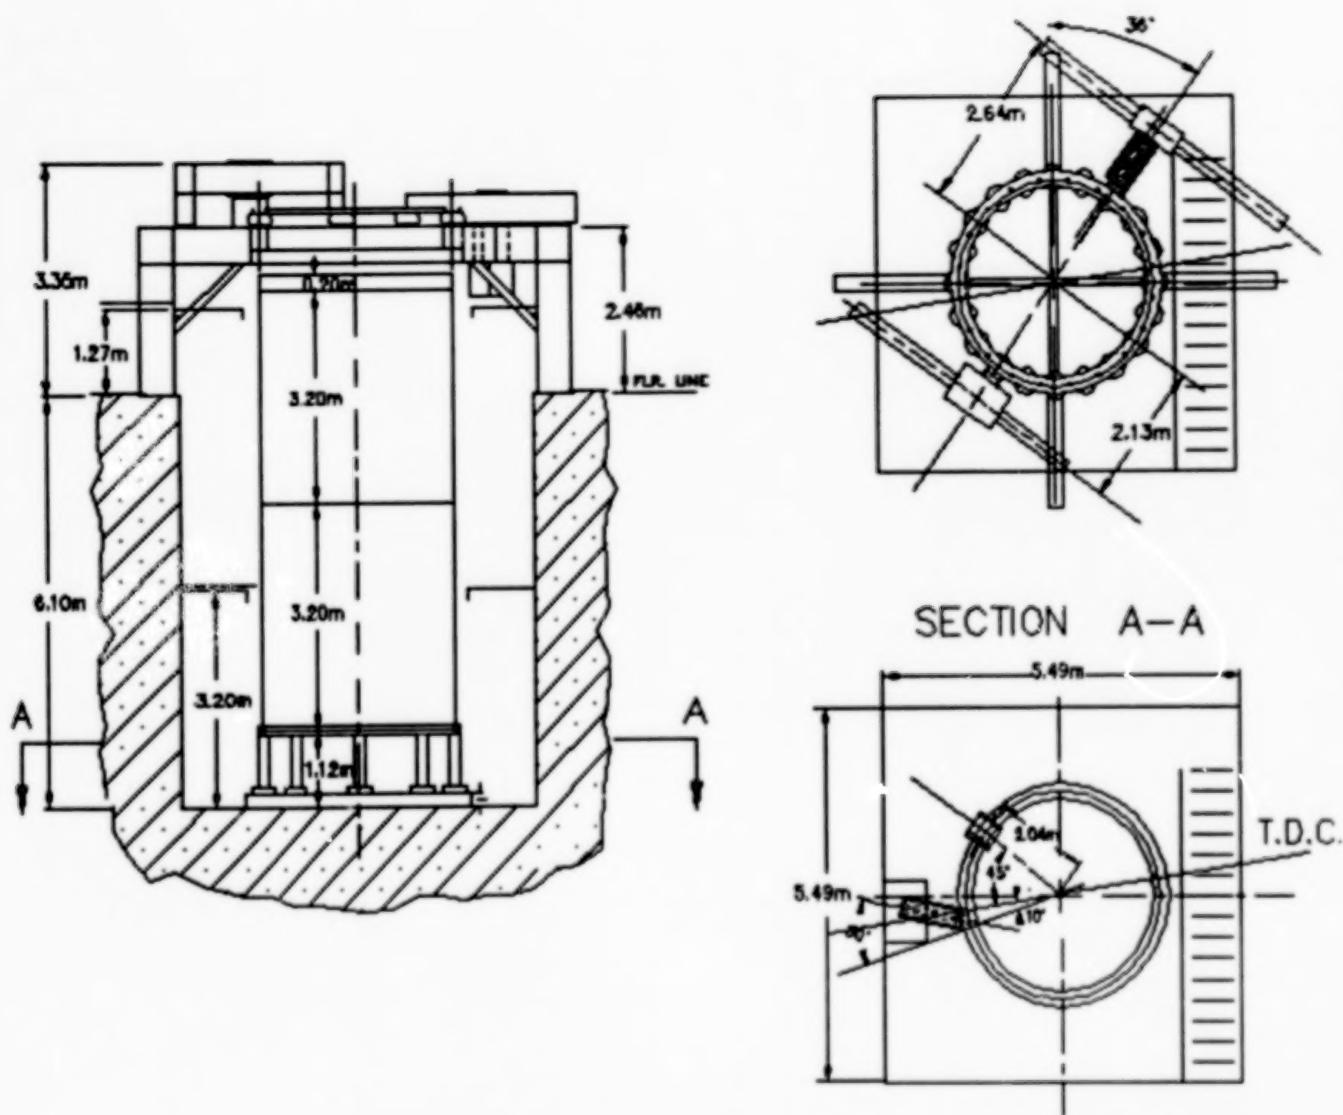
The test facility layout shows the orientation of the test article as installed.
